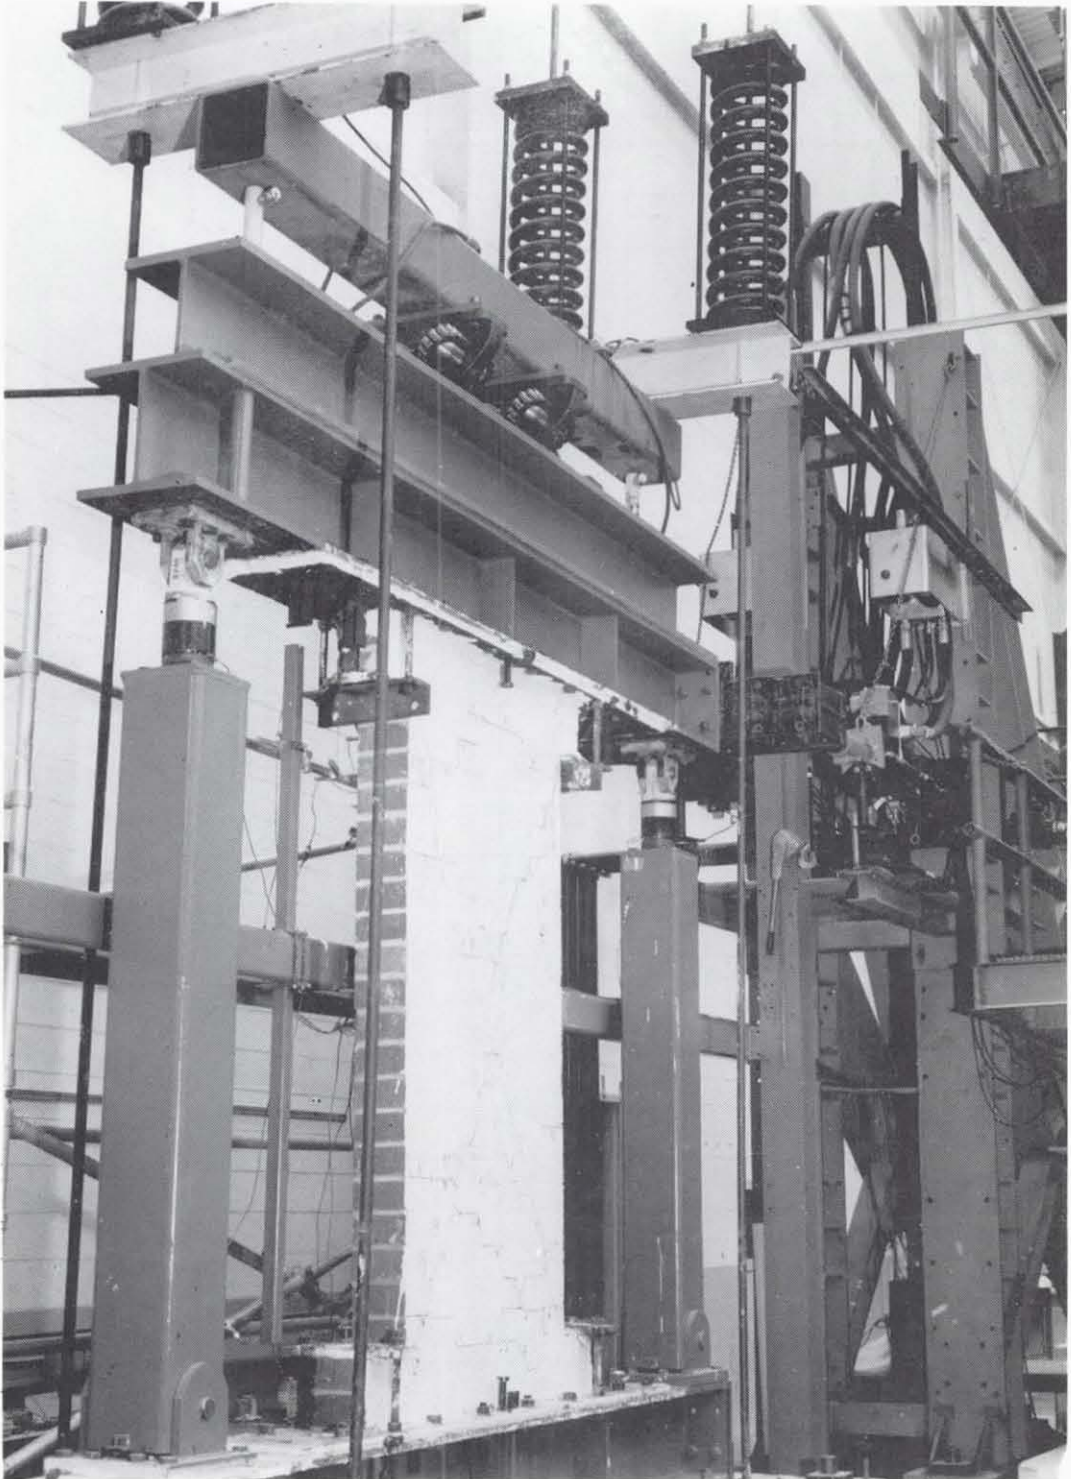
OVERVIEW OF SINGLE PIER TEST
